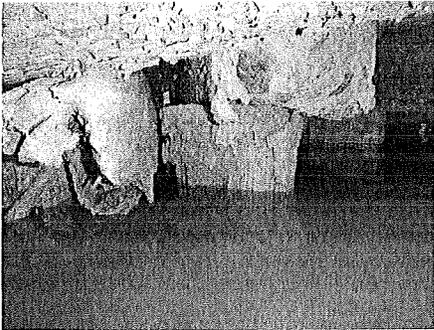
Pedestal #6, pile on east face in poor condition due to section loss and severe worm damage, looking west.
